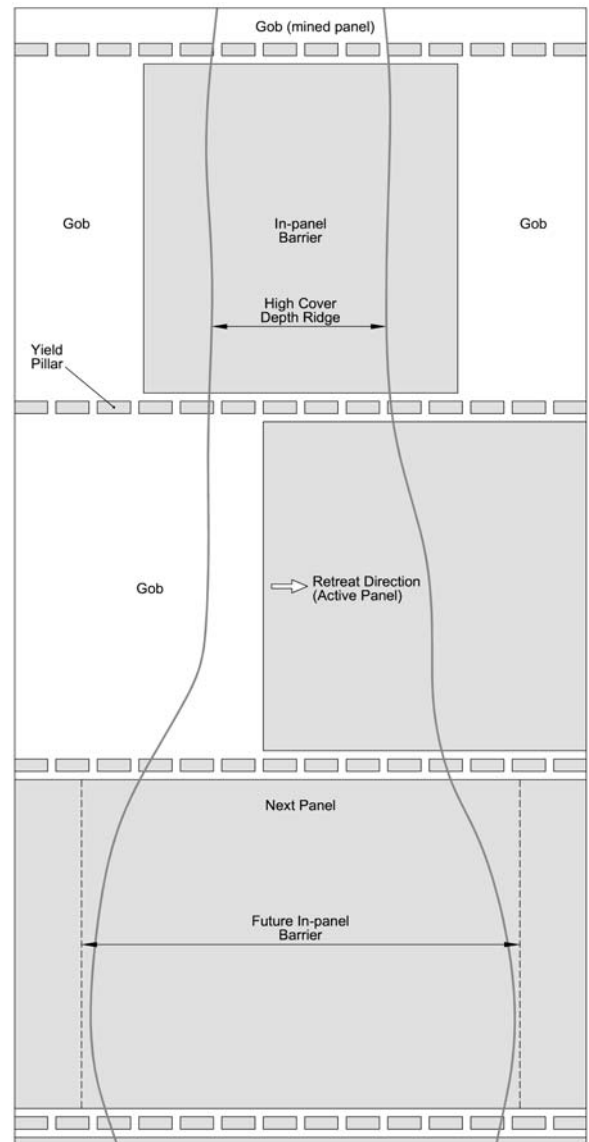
Plan of Modified "Checkerboard" Panel-barrier System under a Deep-cover Ridge
